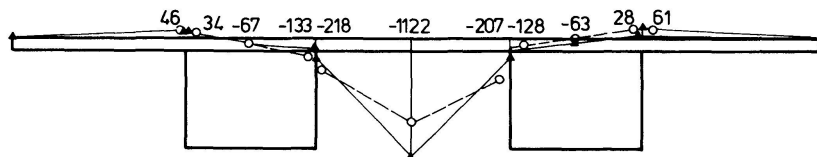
Transverse Stresses at Section 14 for Load Case 3.
